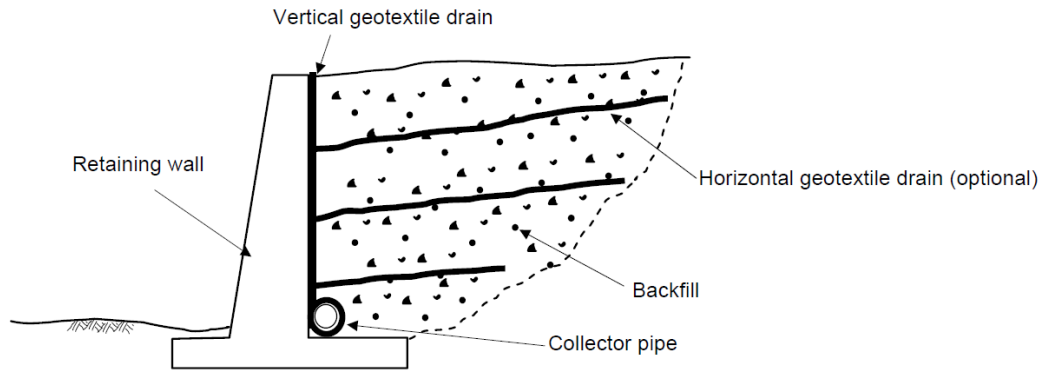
Geotextile drain behind a retaining wall. A similar arrangement may be used behind bridge abutments
